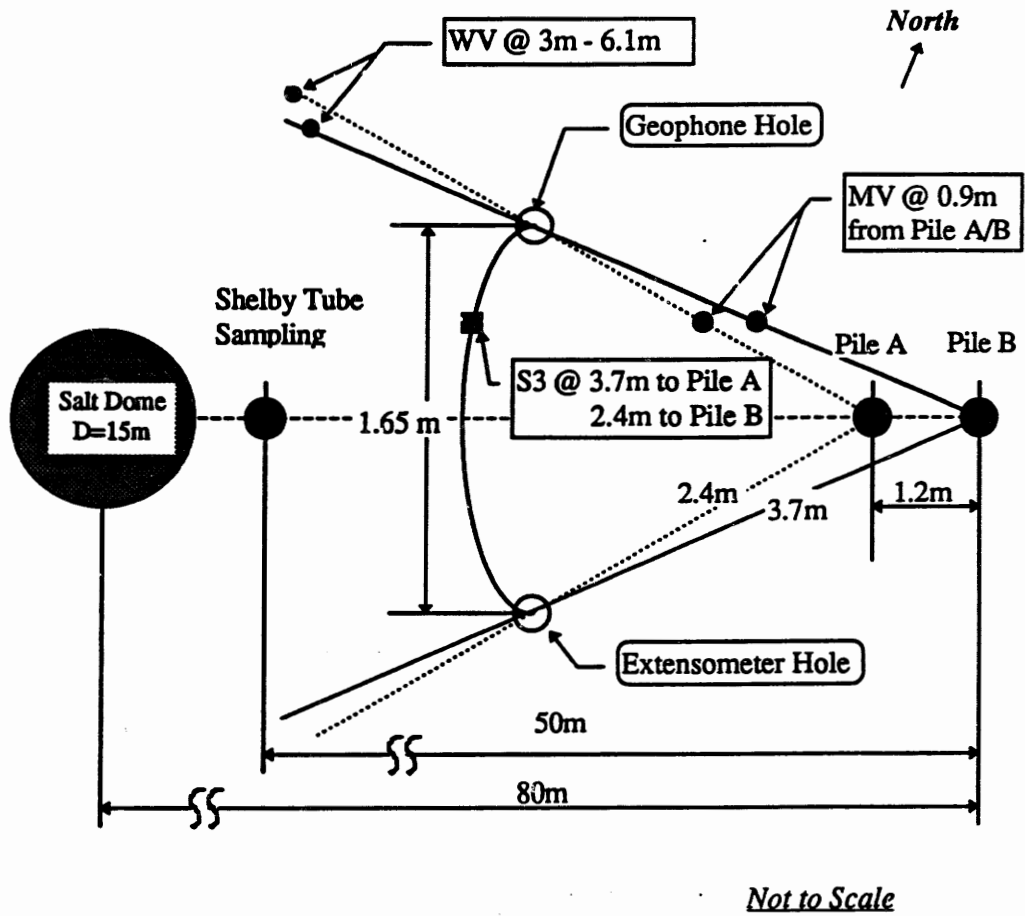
Field Test Design at Site 1 (Selma, NC)
